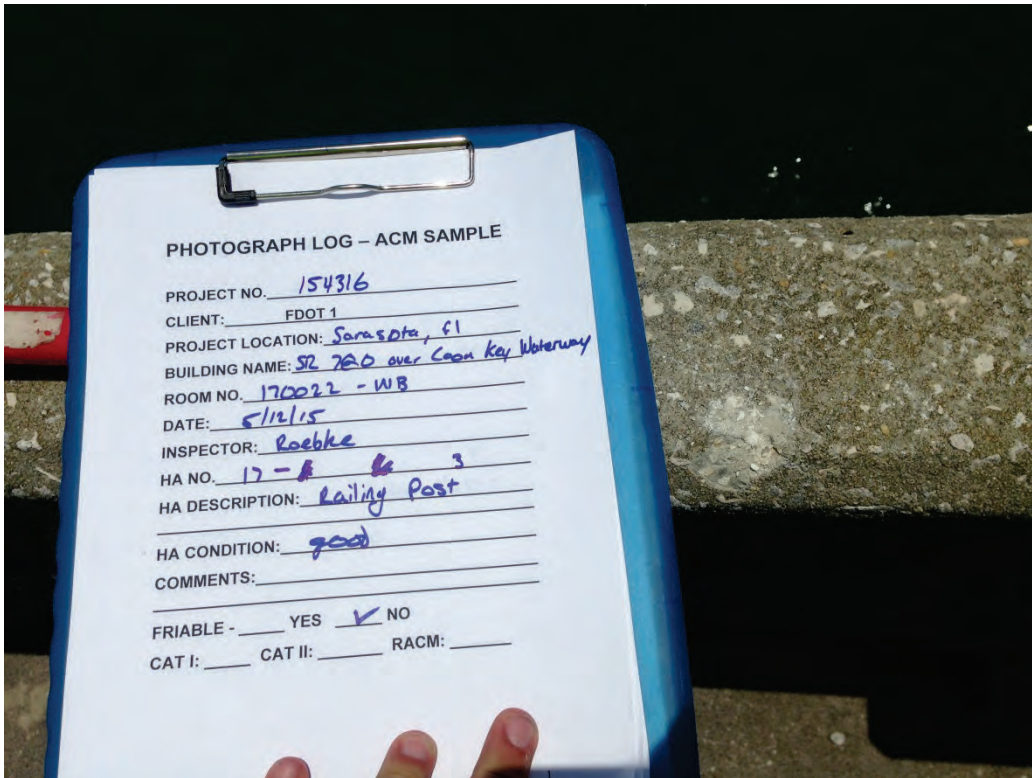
5/12/15 – SAMPLE 17.3 – HA 17
